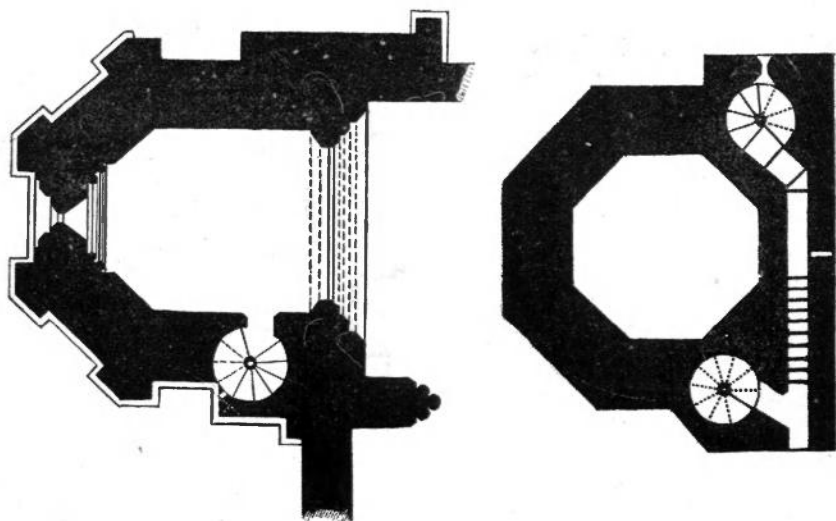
STANWICK CHURCH, GROUND FLOOR AND SECOND STORY OF TOWER.
